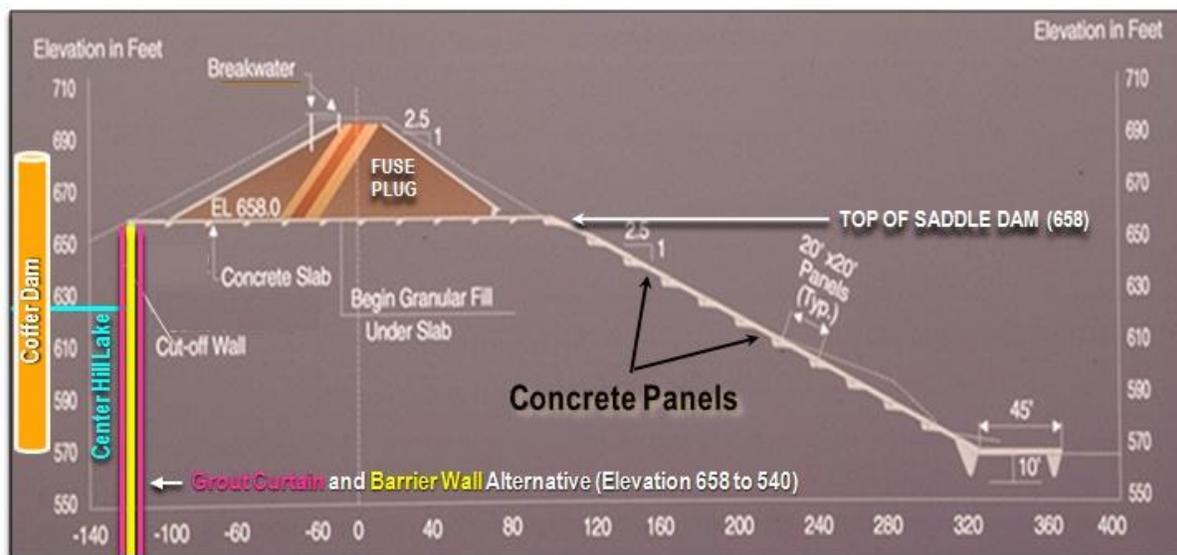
Cross-section of the Saddle Dam, Grout Curtains, Barrier Wall, and Coffer Dam.
